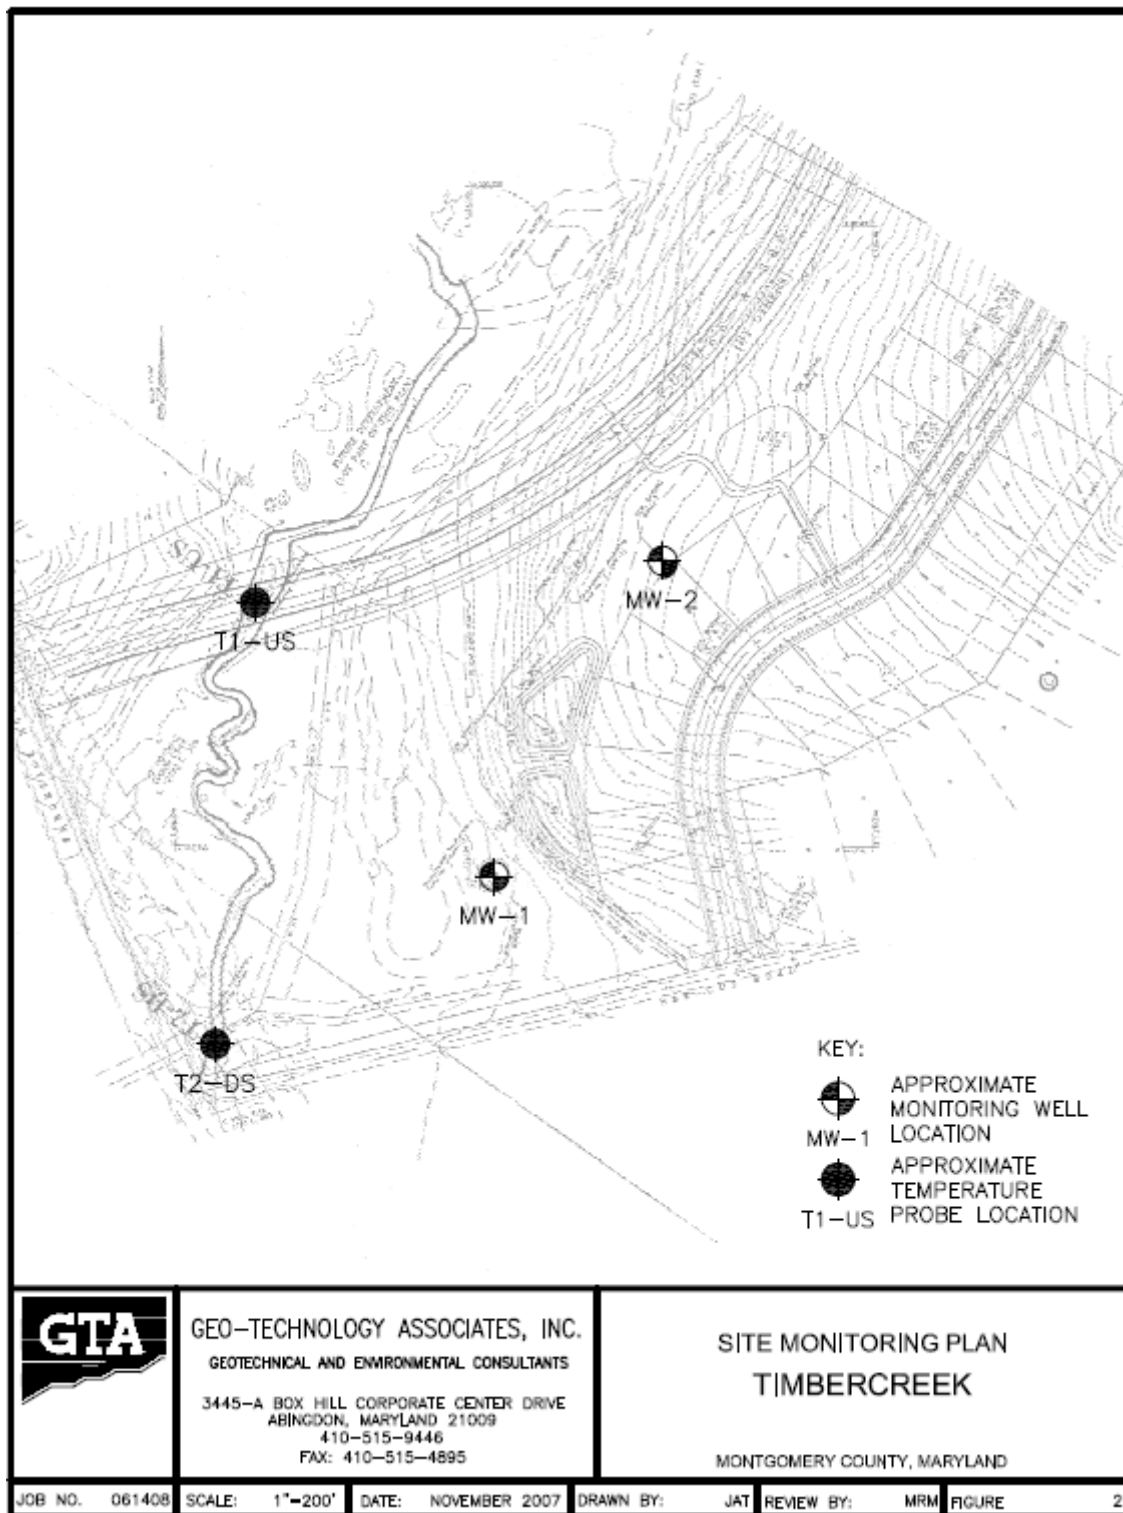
Timbercreek site plan and monitoring locations (GTA 2007).
